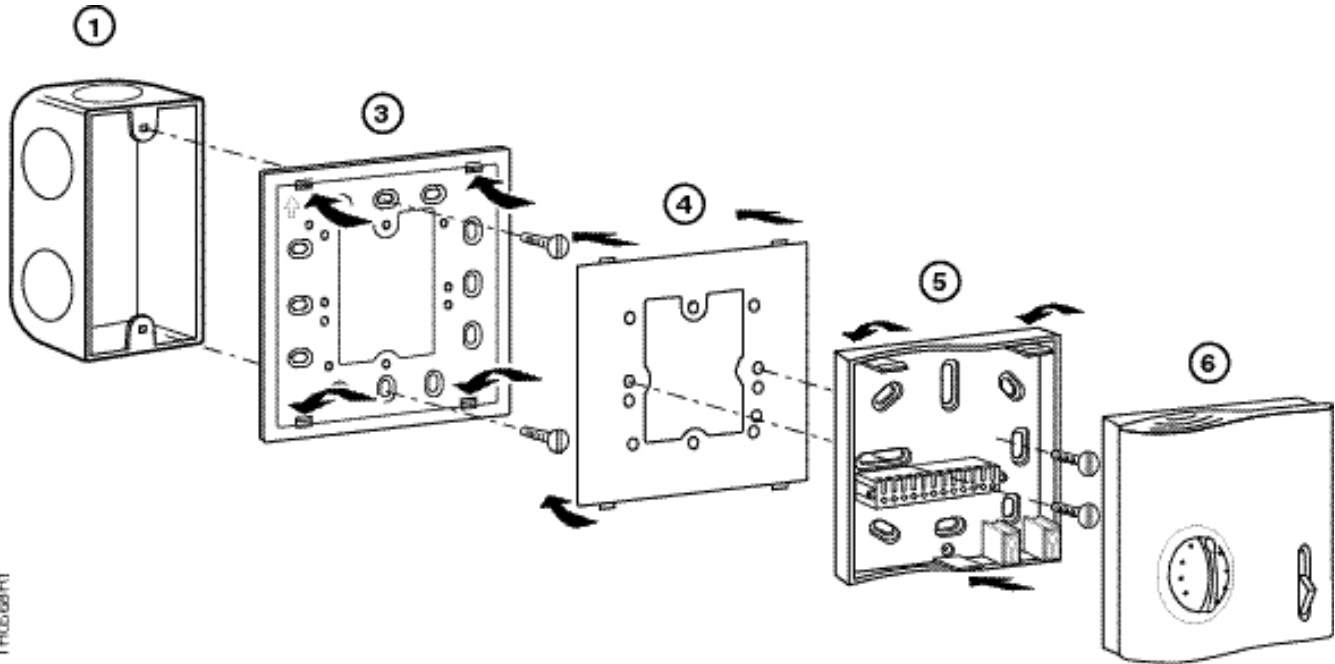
2 x 4-inch Electrical Wall Box Installation.
